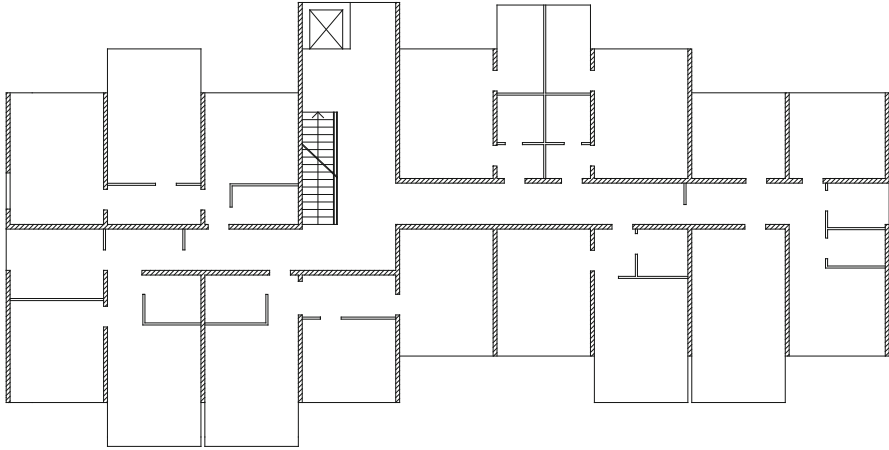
Typical multi-storey apartment building whose load-bearing structure consists of structural walls
